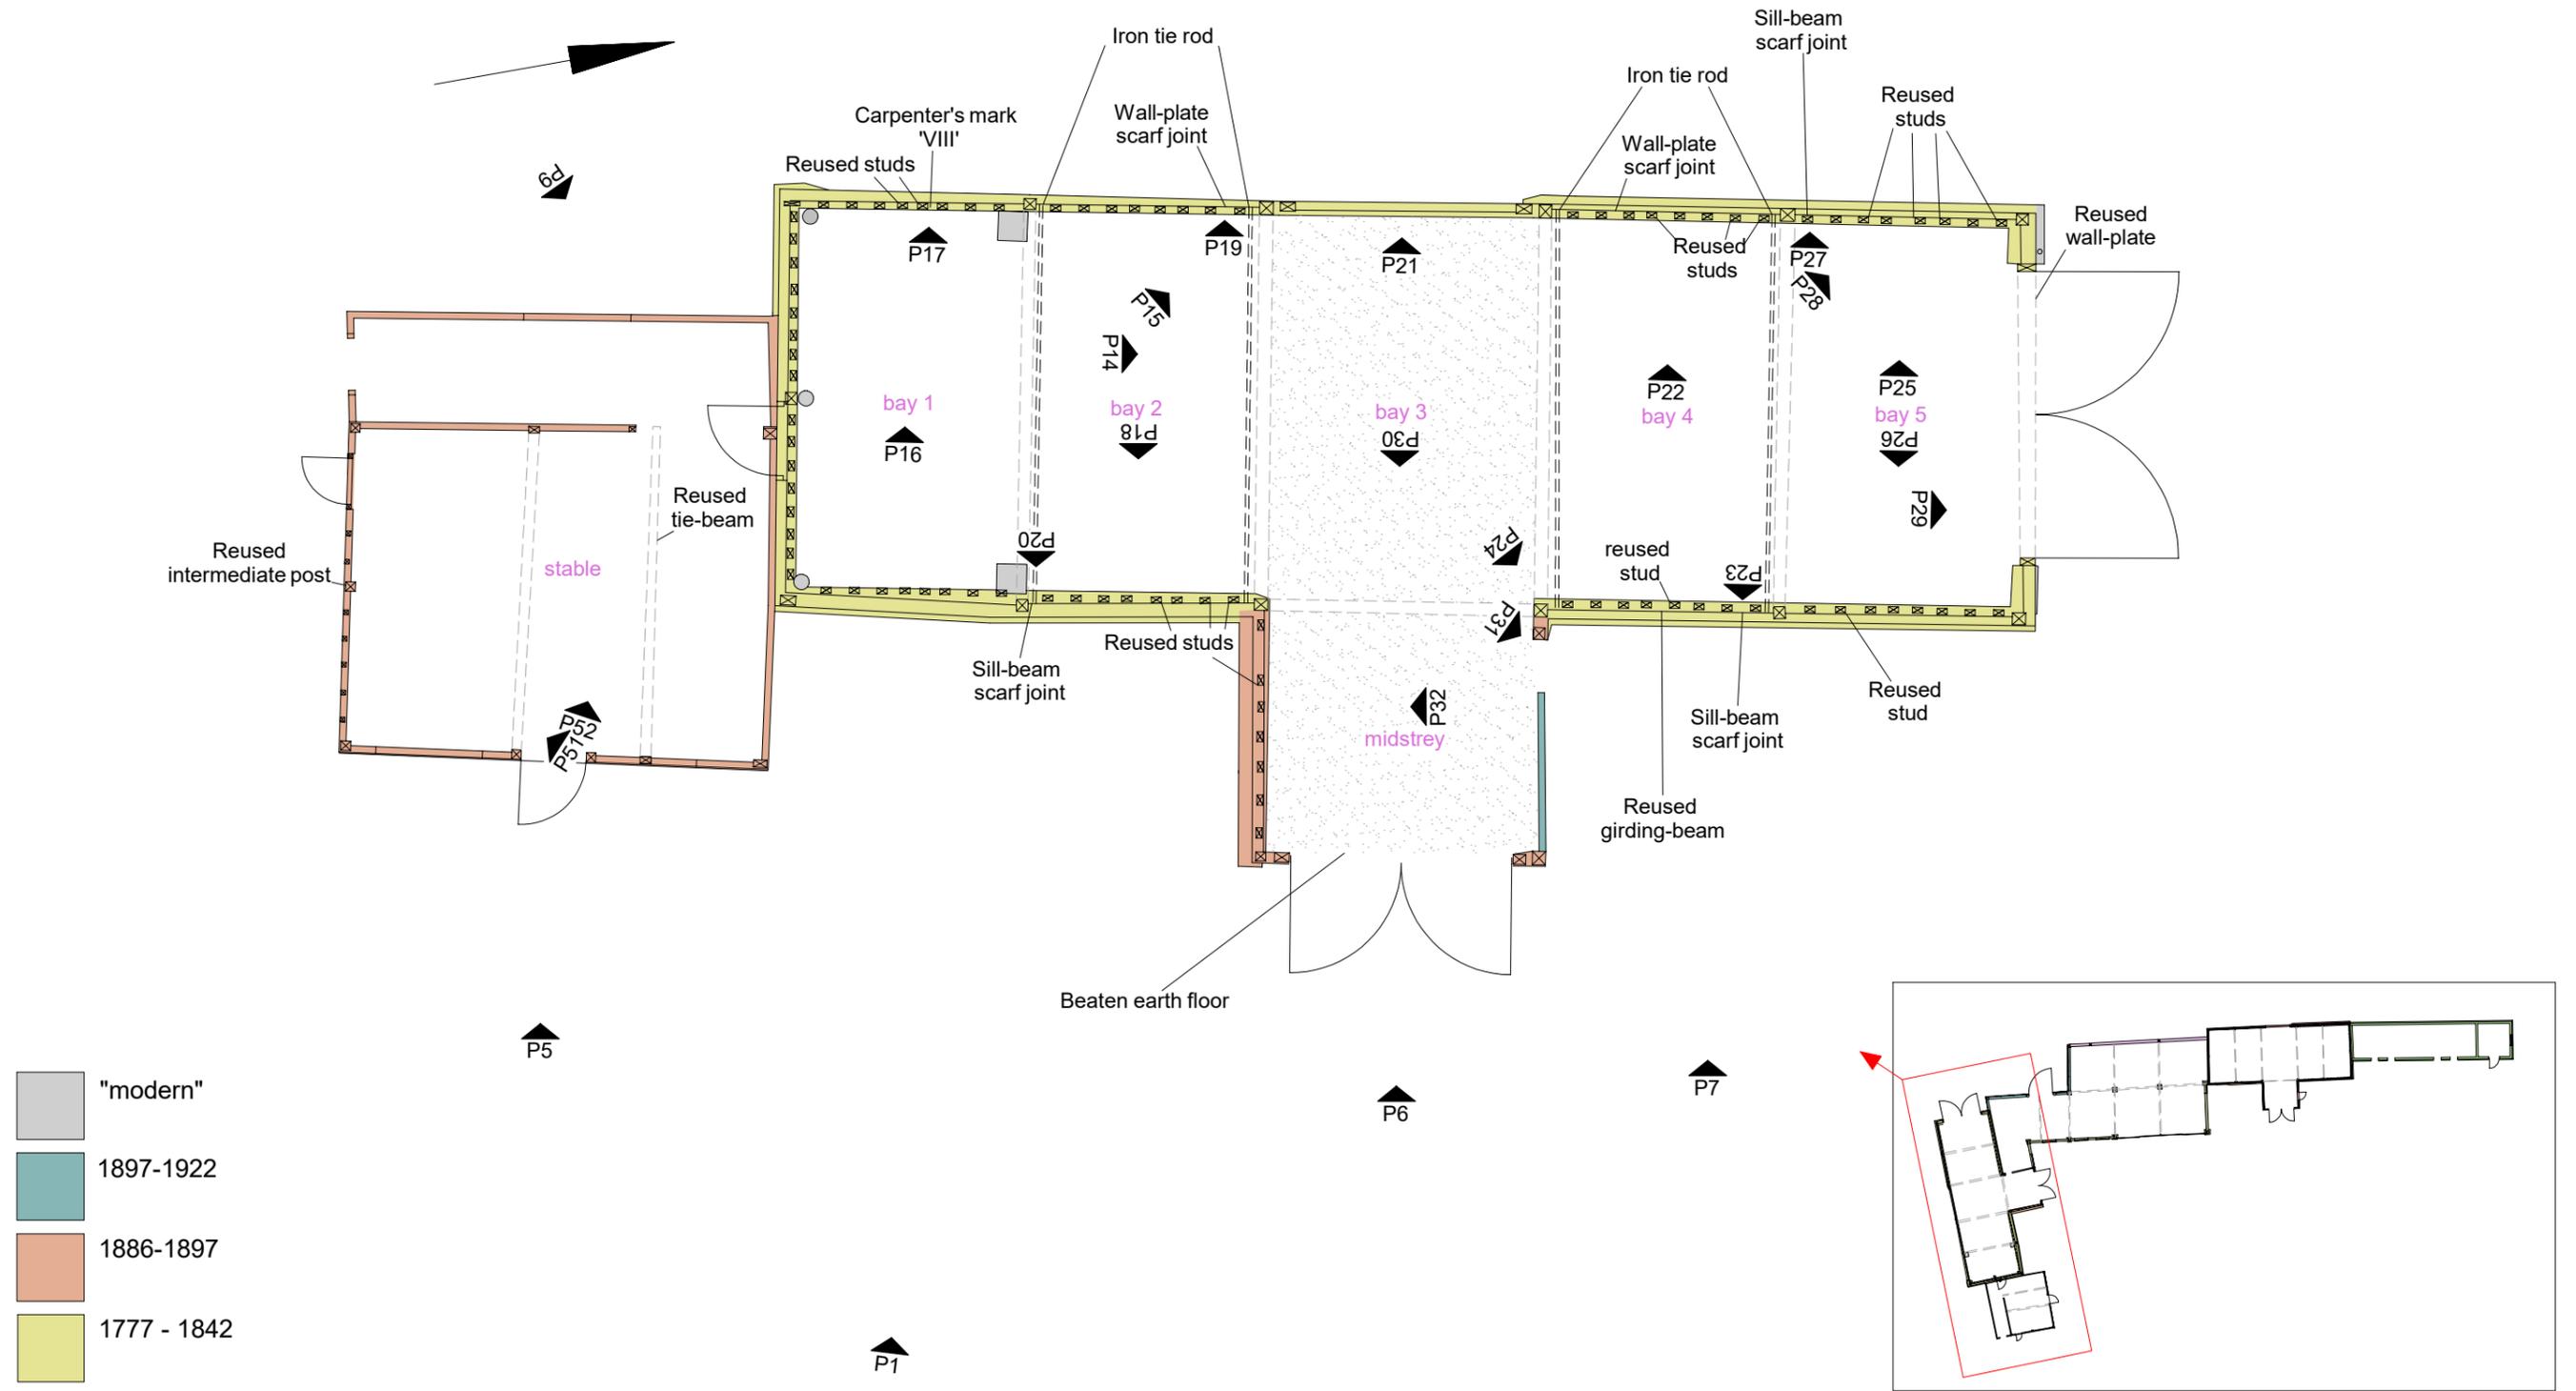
Floor plan of threshing barn A and stable. Location and direction of photographs reproduced in the text shown.
